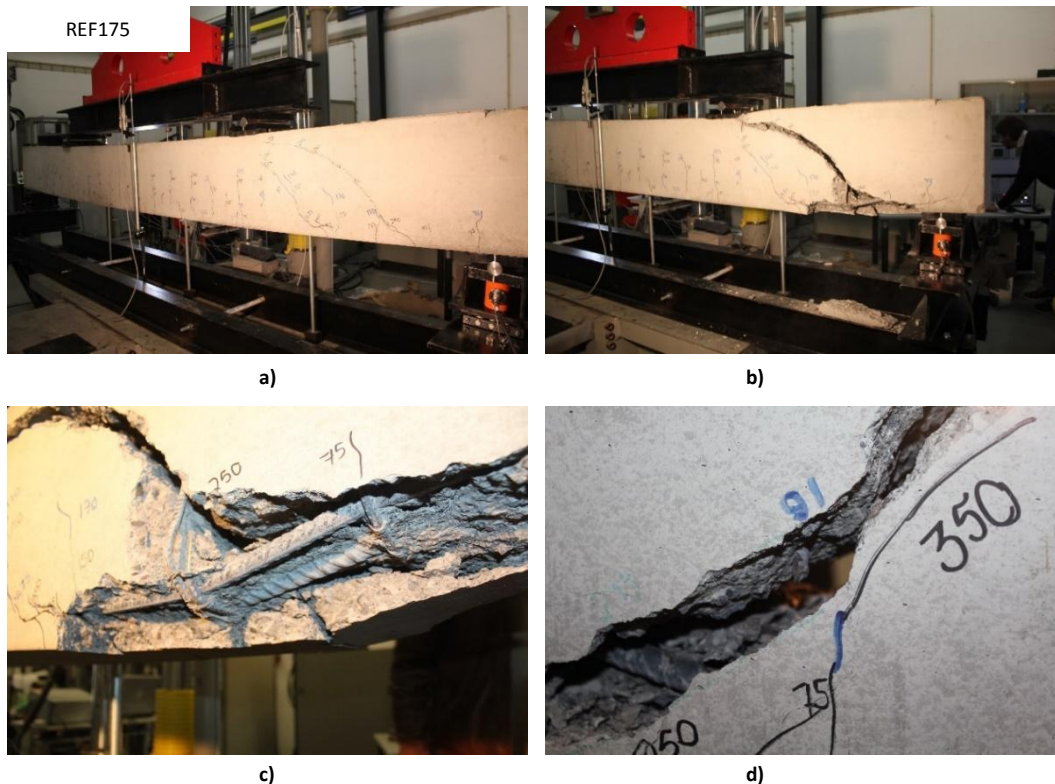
REF175 beam failure: a) overall view immediately before failure; b) view of the support after failure; c) bottom reinforcement; d) broken stirrup
